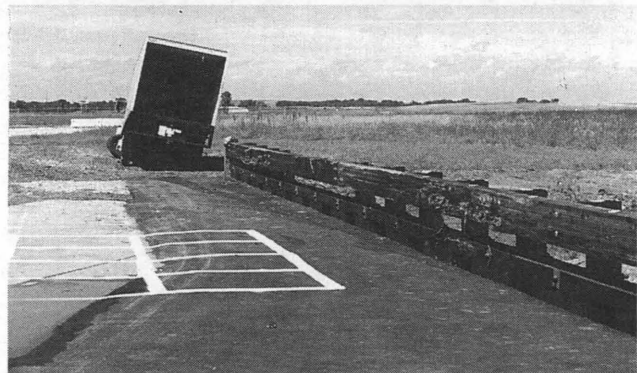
Impact location, vehicle damage, and bridge rail damage, Test FSCR-1.
